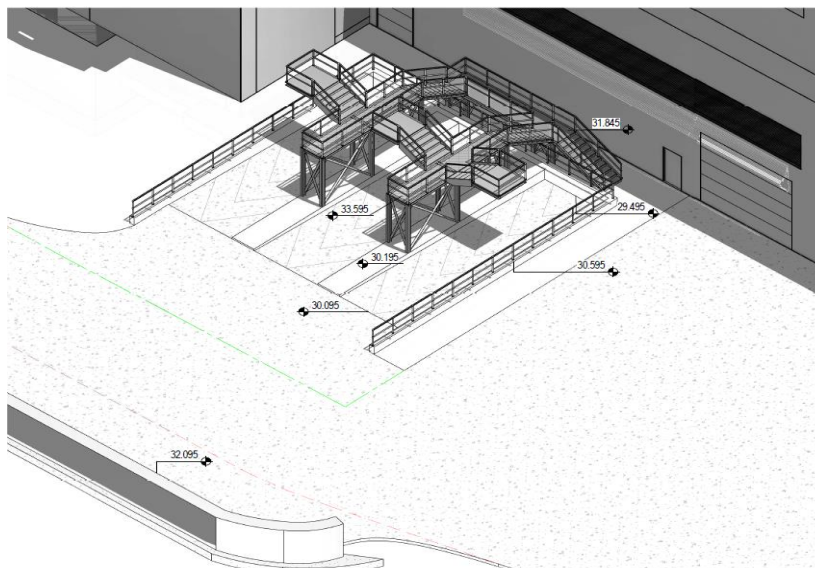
Proposed Upgrade to Existing Tanker Unloading area
